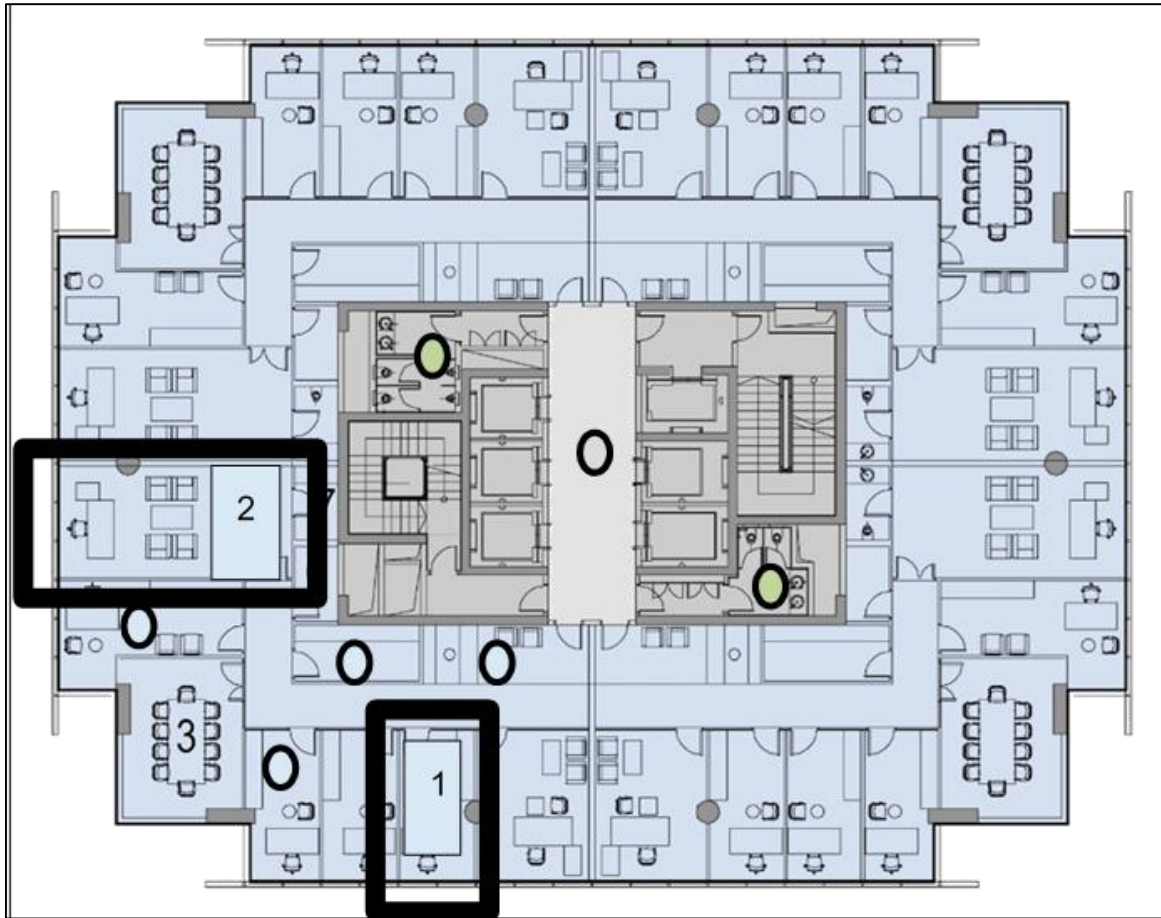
The 18th floor's plan of A block (official building) of TEPE PRIME and the location of 1<sup>st</sup> and 2<sup>nd</sup> samples
